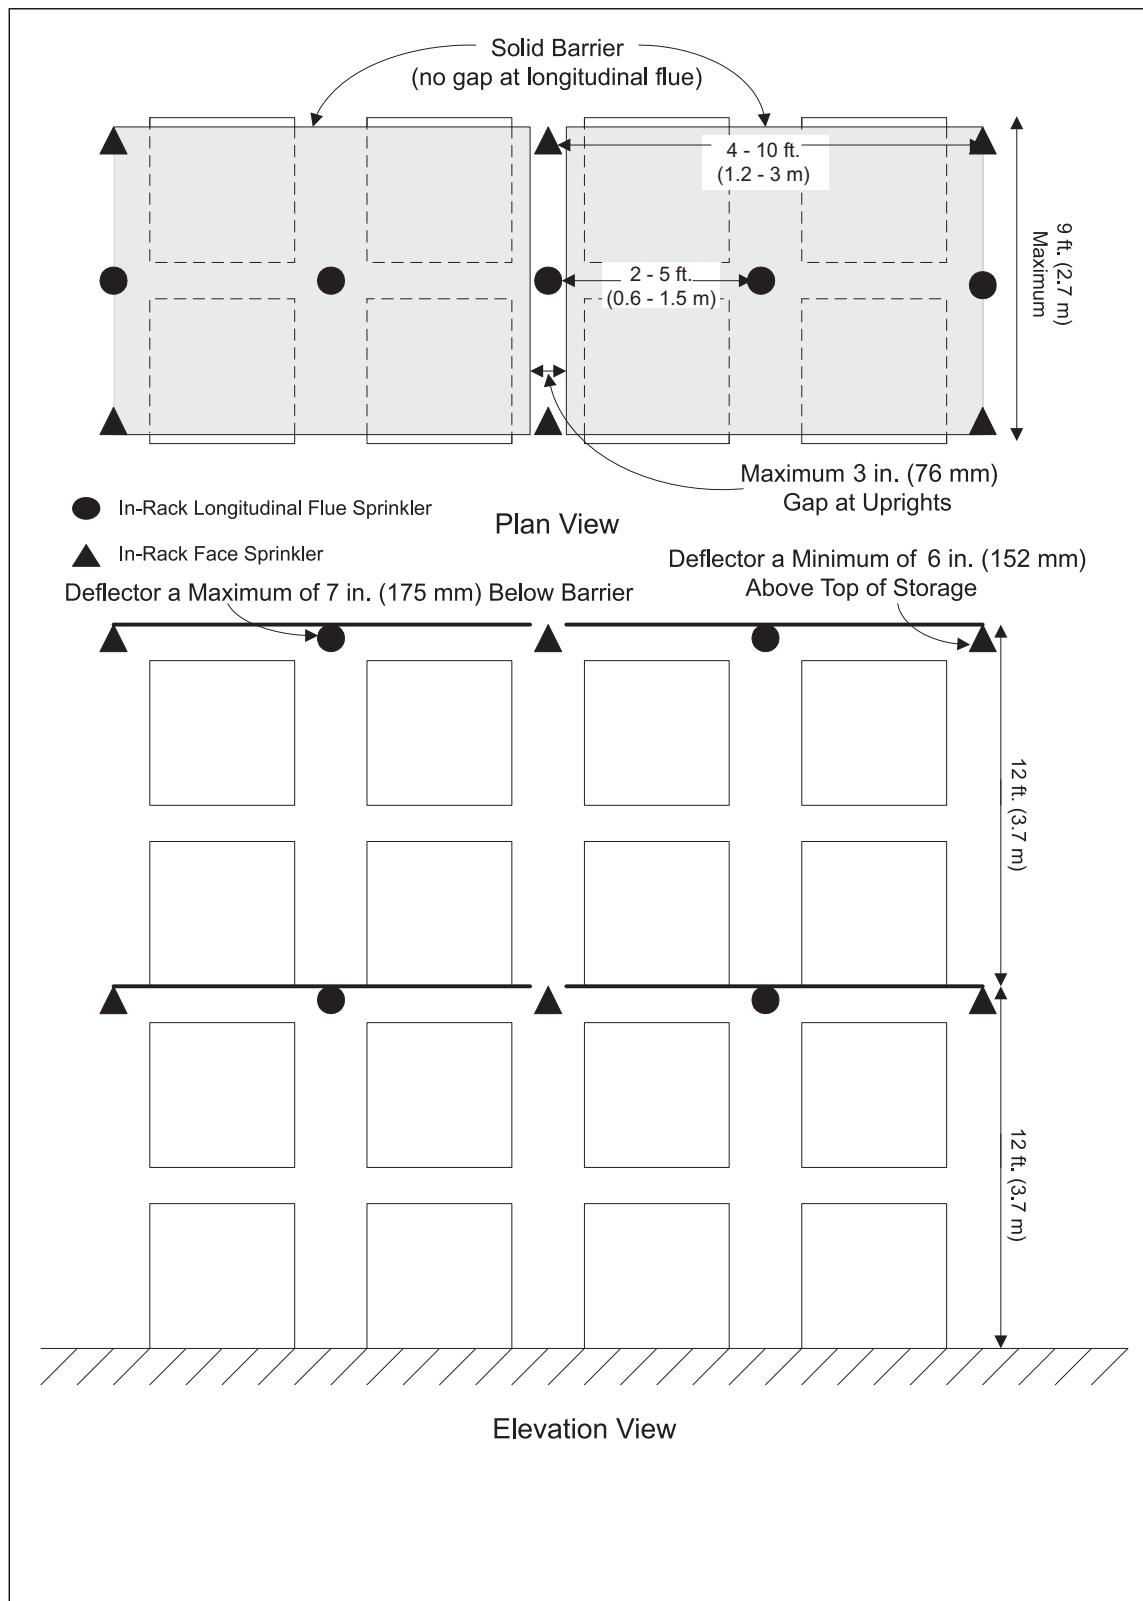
Double-row rack sprinkler layout: fire protection scheme A
